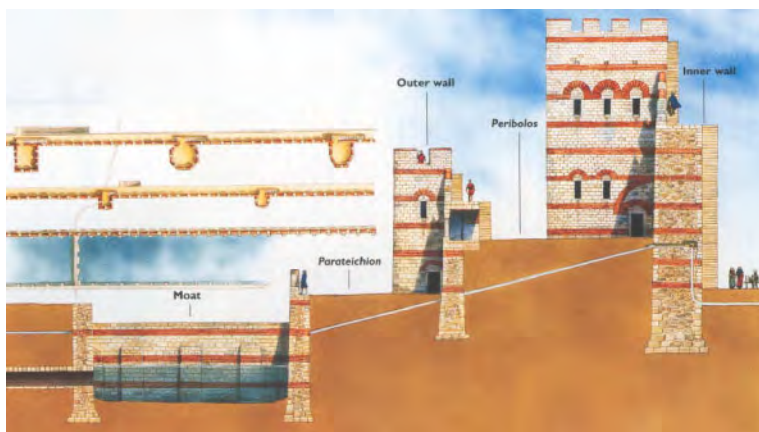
Typical cross section and plan of the Theodosian walls and towers. On the top left of the plan, the different shapes of the towers (modified after Turnbull, 2004).
